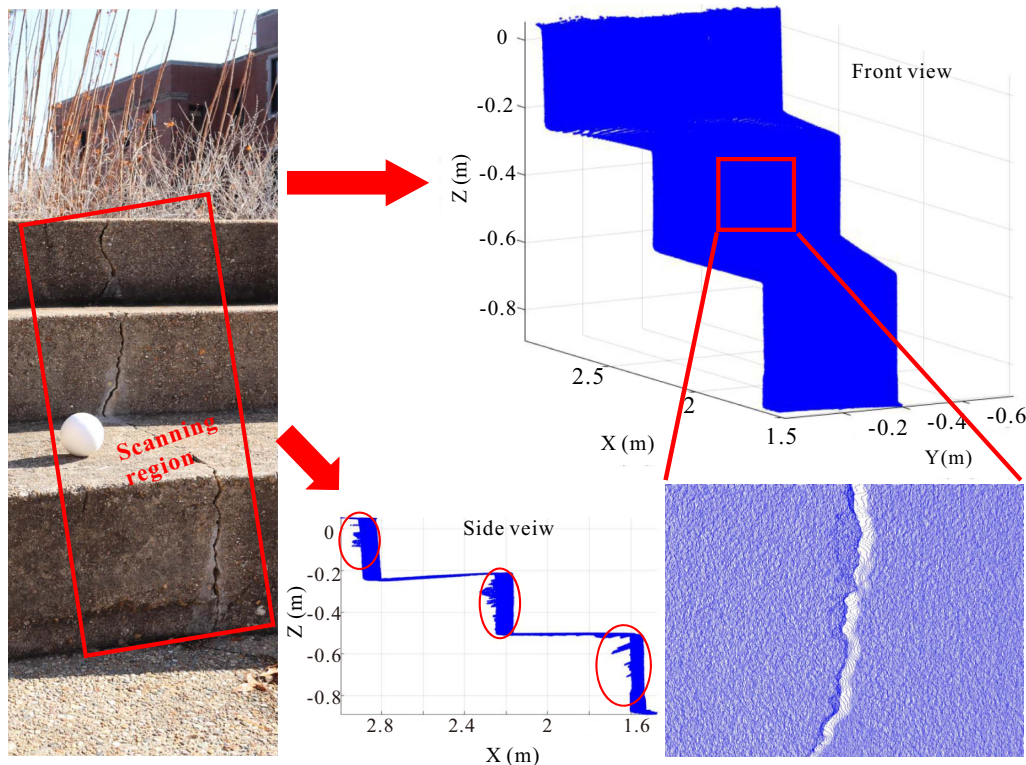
Point clouds collection of cracks in the stair case.
